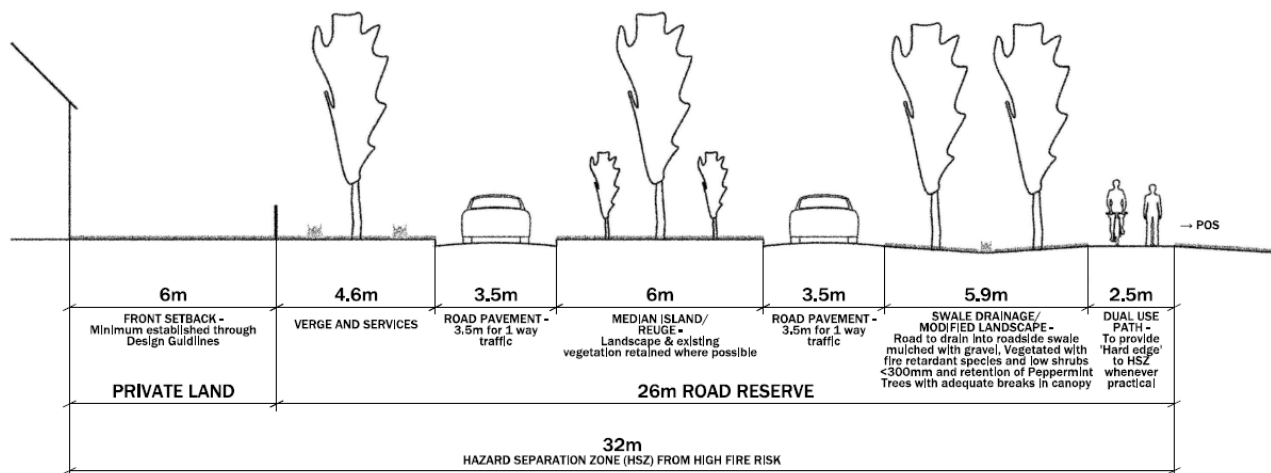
Indicative cross section of the access street at the eastern edge of the development footprint.
